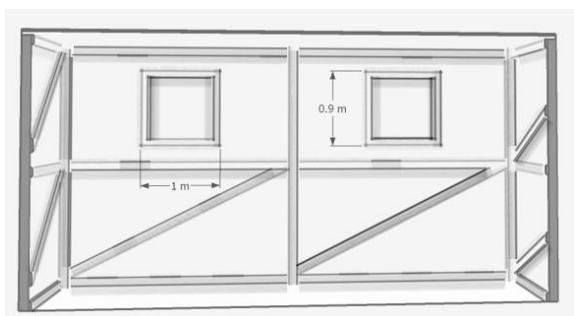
Shelter prototype longitudinal section (Source: authors)
